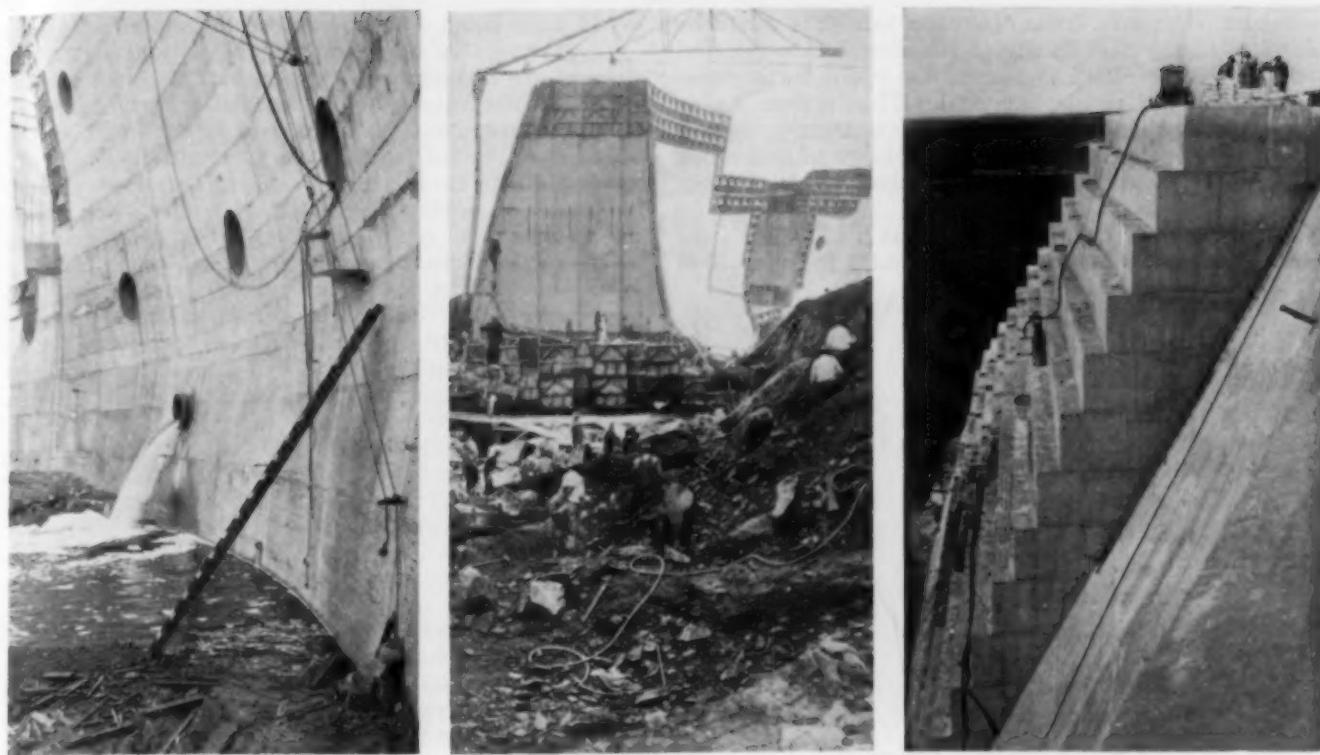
OPENINGS IN GRAVITY WING WALL AT CREST AND AN OPENING ALONG A TYPICAL VERTICAL JOINT
